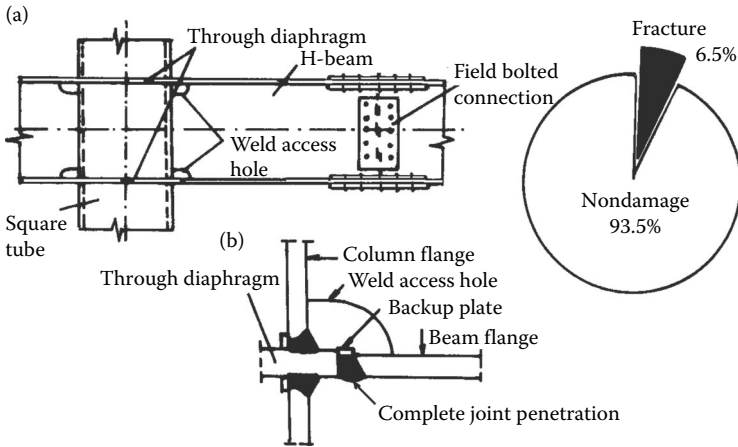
“Column tree” system used in Japan: (a) prefabricated beam-to-column joint; (b) beam-to-column welded connection.
